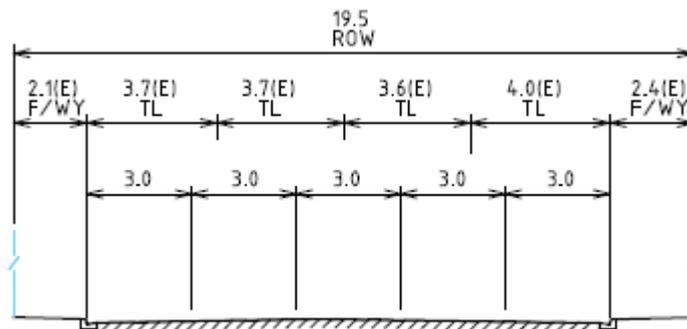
Indicative Cross Section Between Toorak Road and Commercial Road
